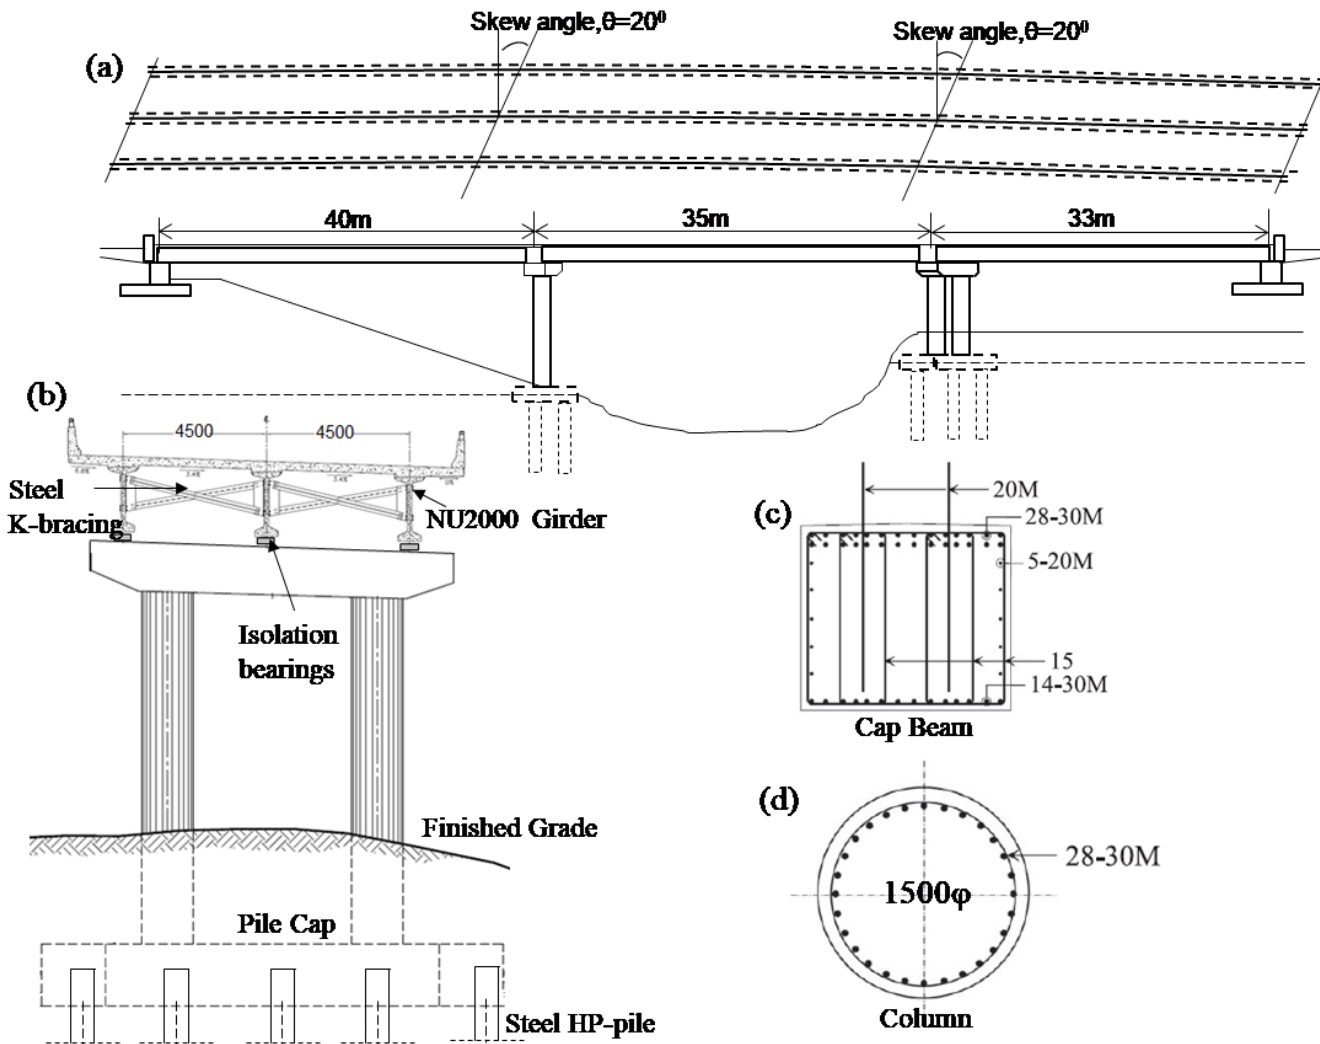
(a) Plan and elevation of the bridge, (b) Typical cross section at pier location, (c) Cross section of the pier cap beam, and (d) Cross section of the column.
